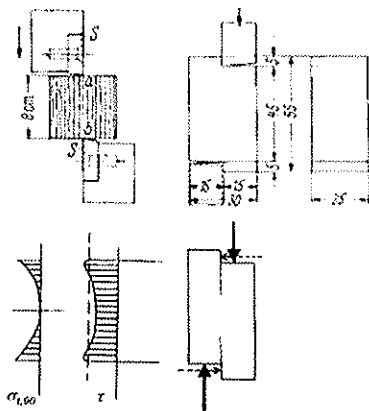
One-sided block shear test (Bauschinger 1883 [13])
